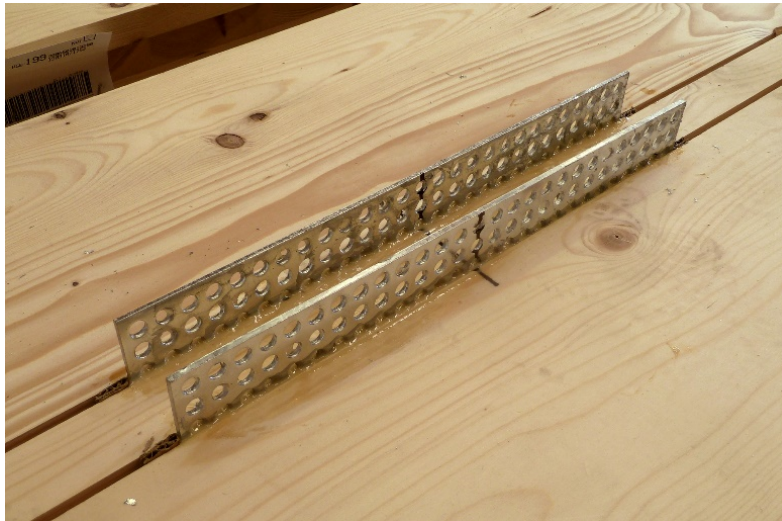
Discontinuous flange-to-web joint made with glued-perforated steel plates.
